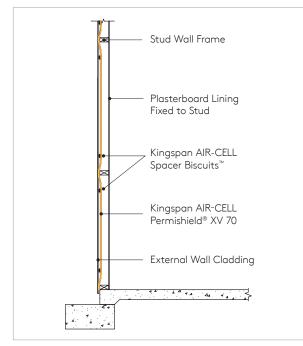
Side elevation of Kingspan AIR-CELL Permishield $^{\otimes}$ XV 70 on a steel-framed wall.
